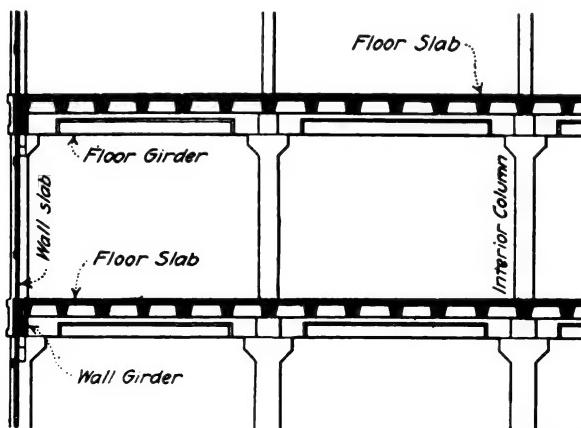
Part section of building on the "Unit System" of reinforced-concrete construction.
